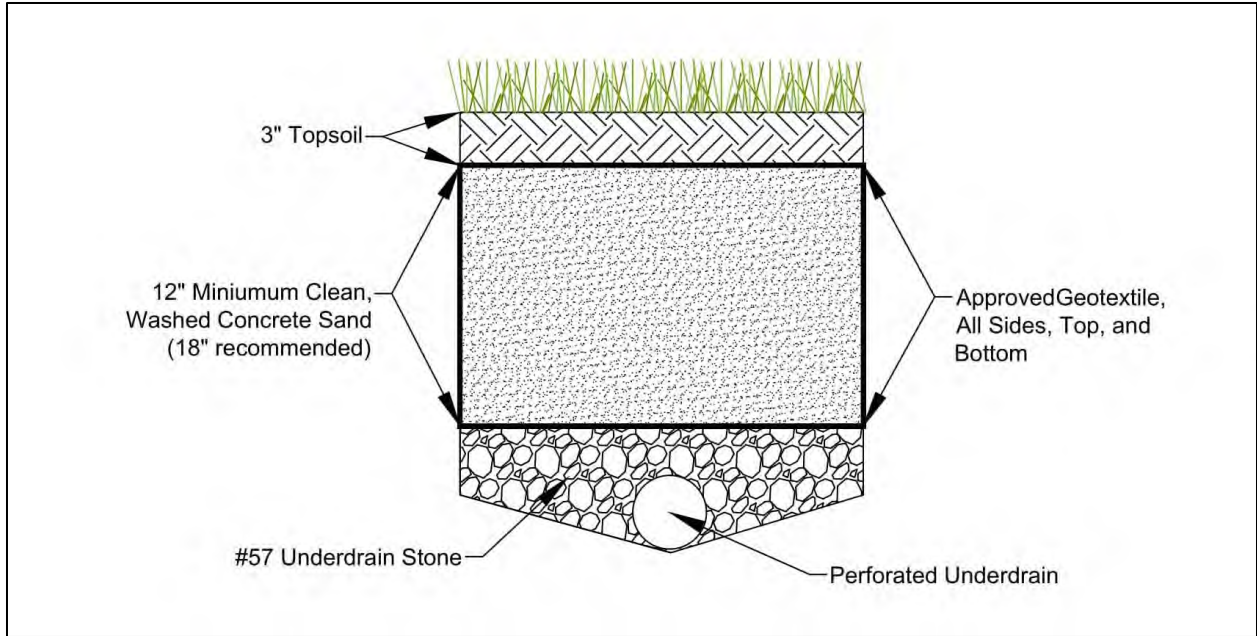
Typical schematic for a nonstructural or surface sand filter (note: material specifications are found in Table 4.44).
